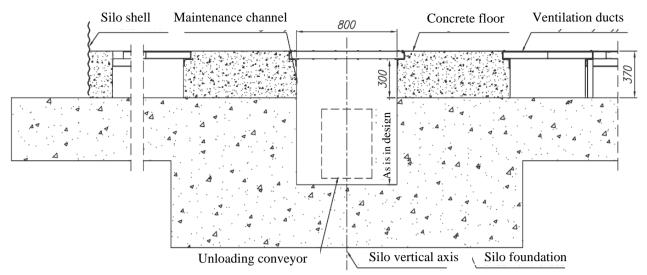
A concrete floor with ventilation ducts - conditions for installation of an underfloor unloading conveyor.
